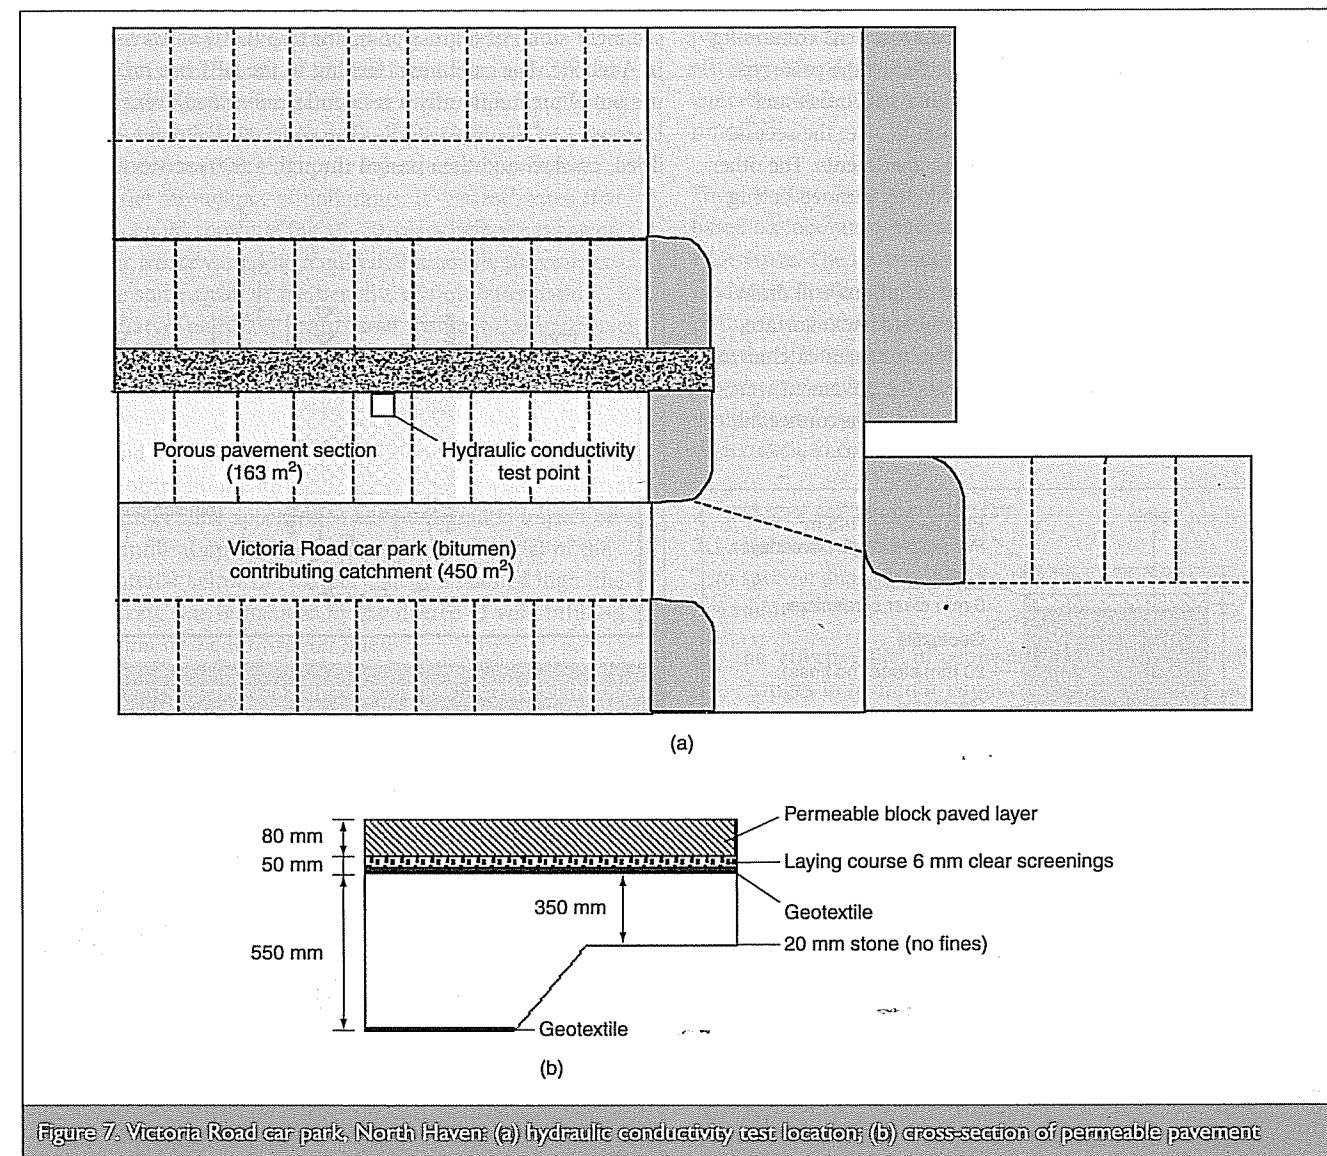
Victoria Road car park, North Haven: (a) hydraulic conductivity test location; (b) cross-section of permeable pavement
